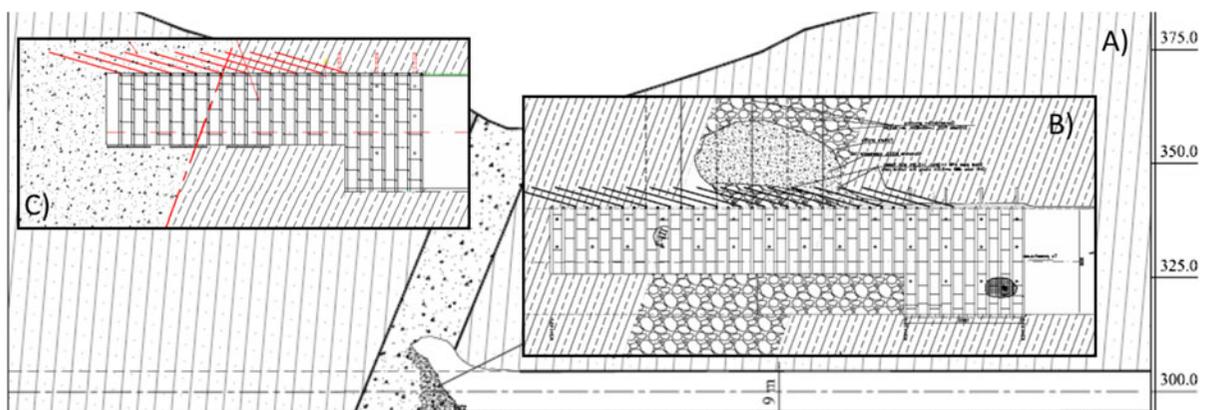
a Cave-in at the first headrace tunnel (modified from PMU5, 2005), b Excavation in the first tunnel of Buon Kuop hydropower project. c Excavation in the second tunnel—longitudinal sections of Buon Kuop hydropower (Trinh 2006)
